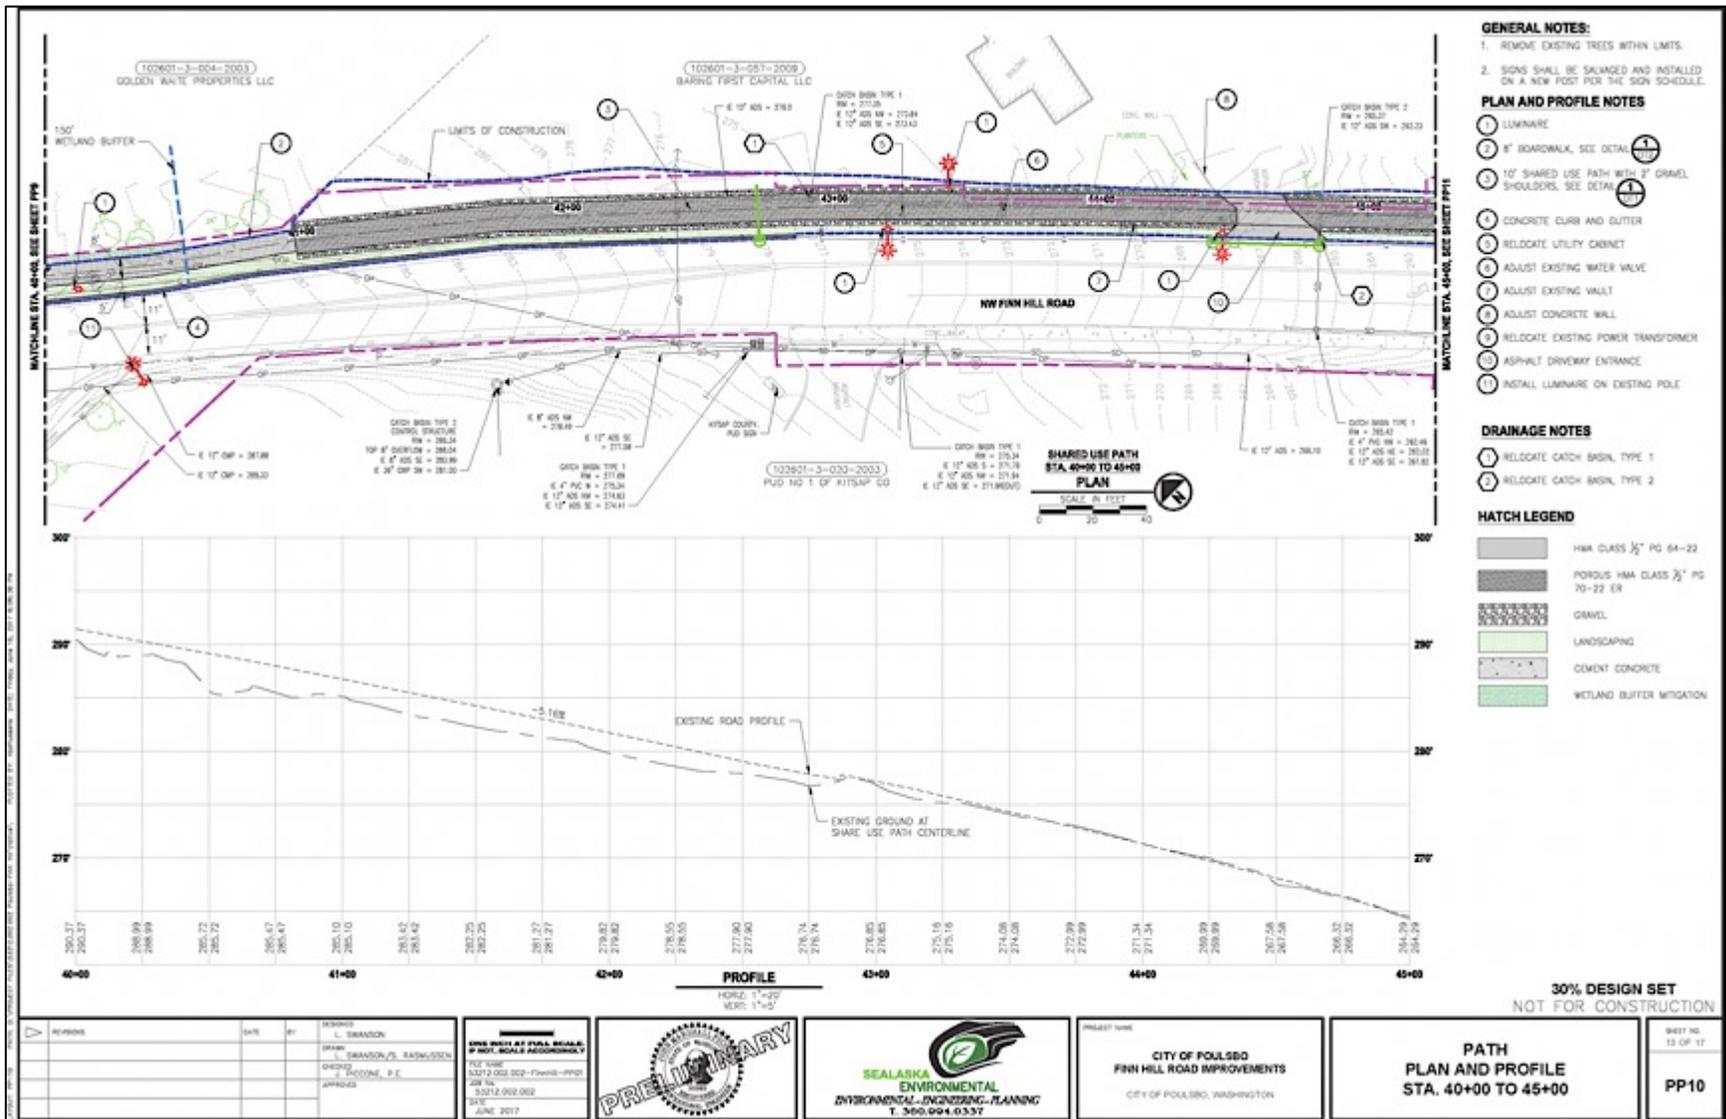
Excerpt from plans provided by City of Poulsbo showing typical proposed work.
